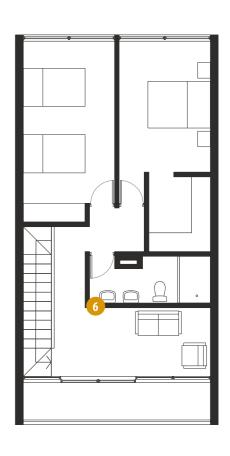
TYPOLOGY G\_GROUND FLOOR PLAN
